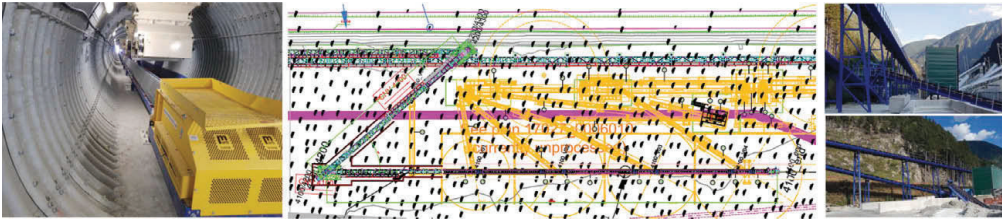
General plan overview site Mules with external crushing plant and extraction pits.
